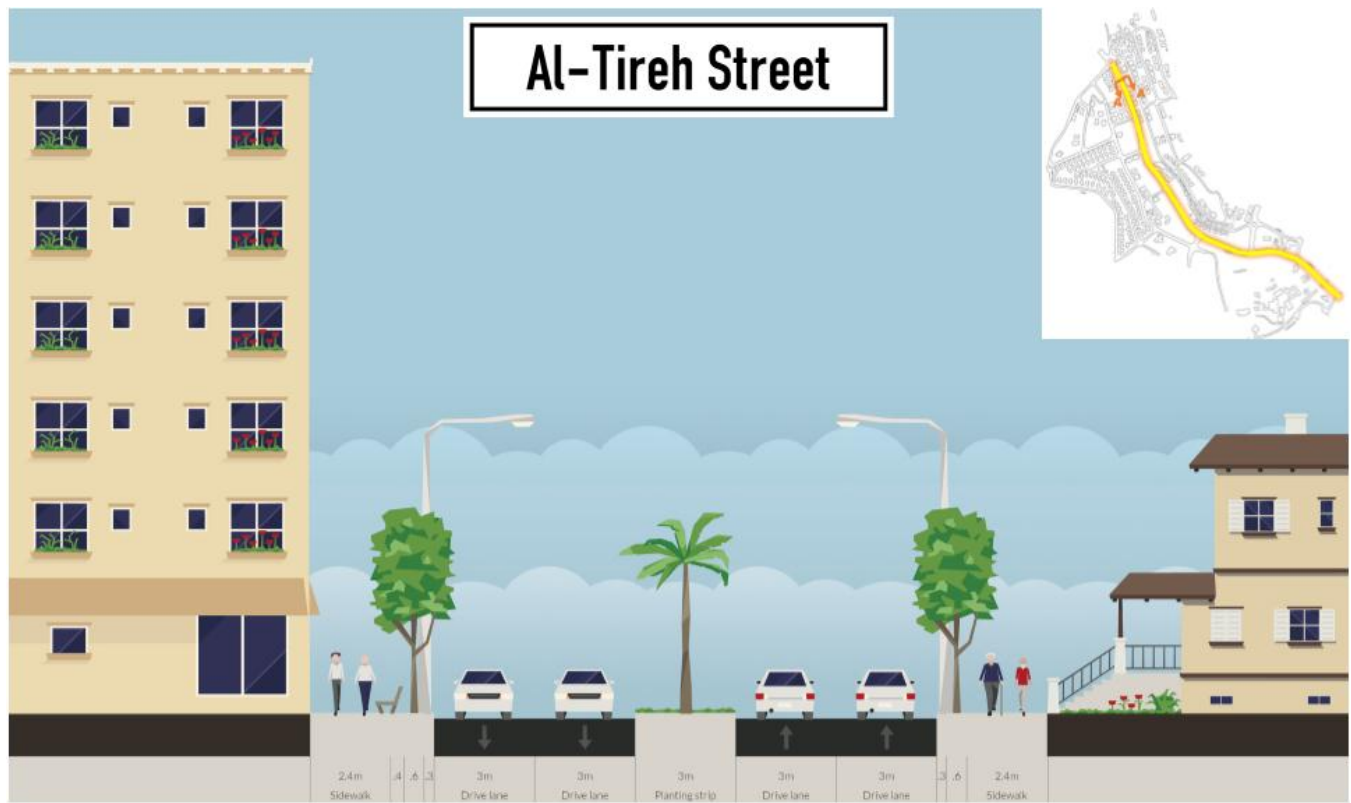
MAIN STREET SECTION WITH BUILDINGS ON TWO SIDES
